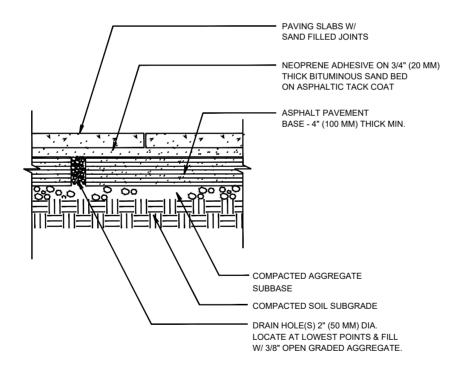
A typical cross section with an asphalt base and bitumen-set paving slabs
